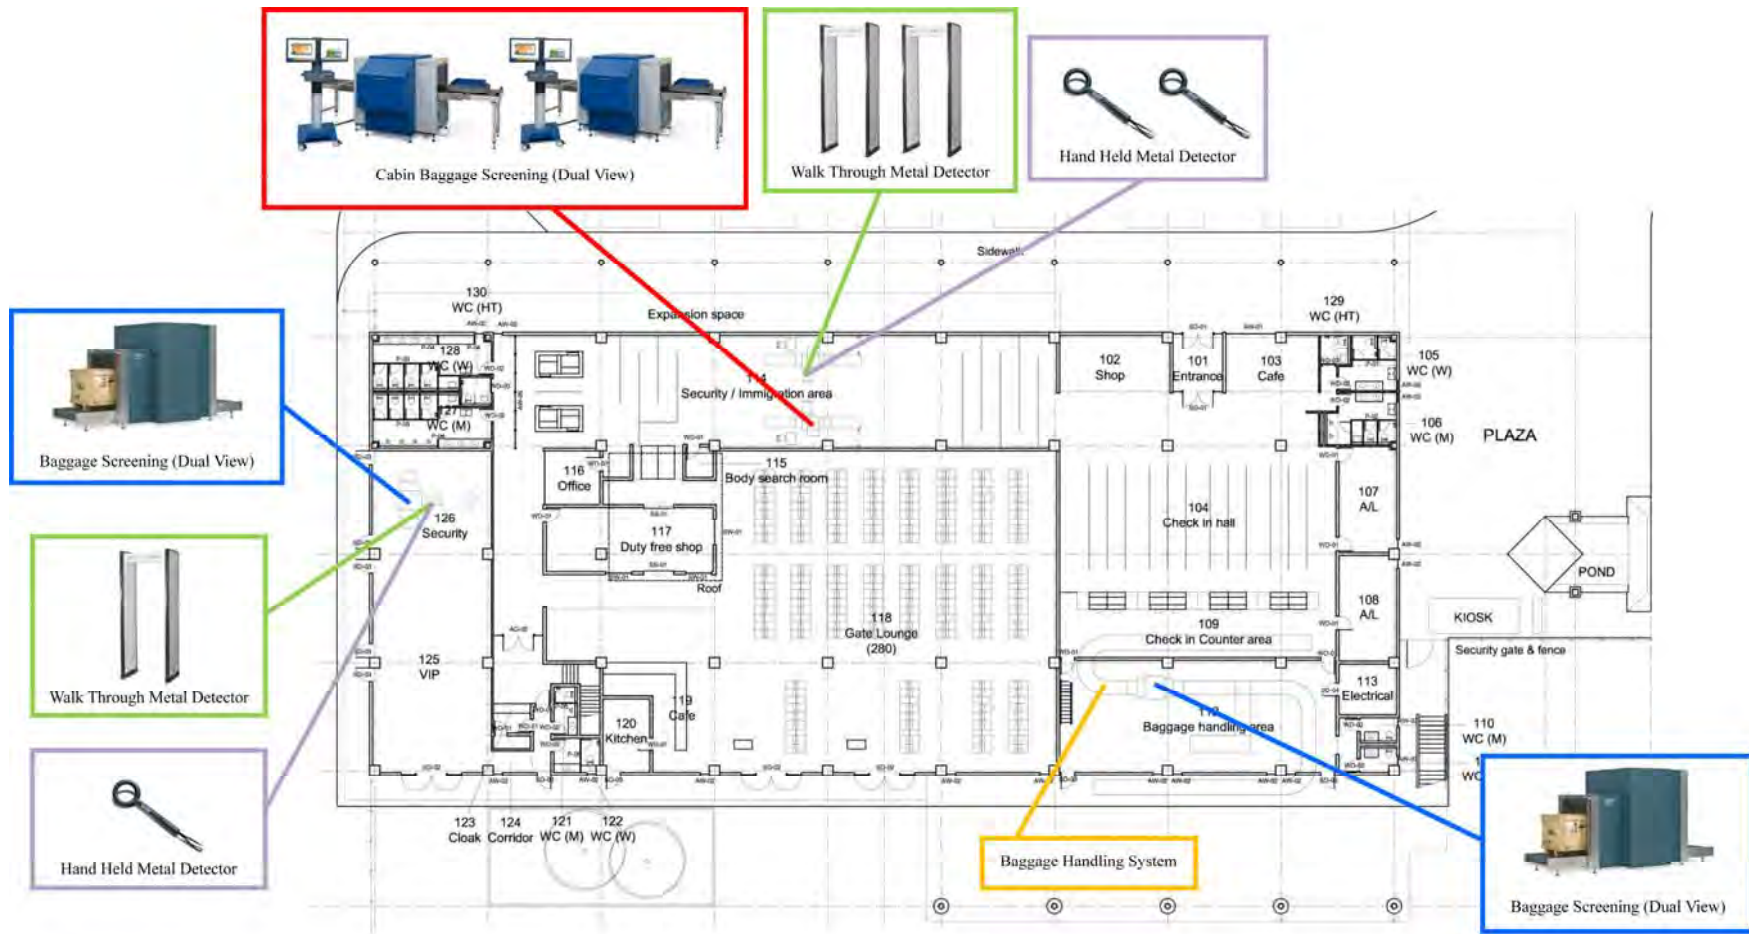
Special Equipment Layout Plan -1 (IDT 1st Floor)
